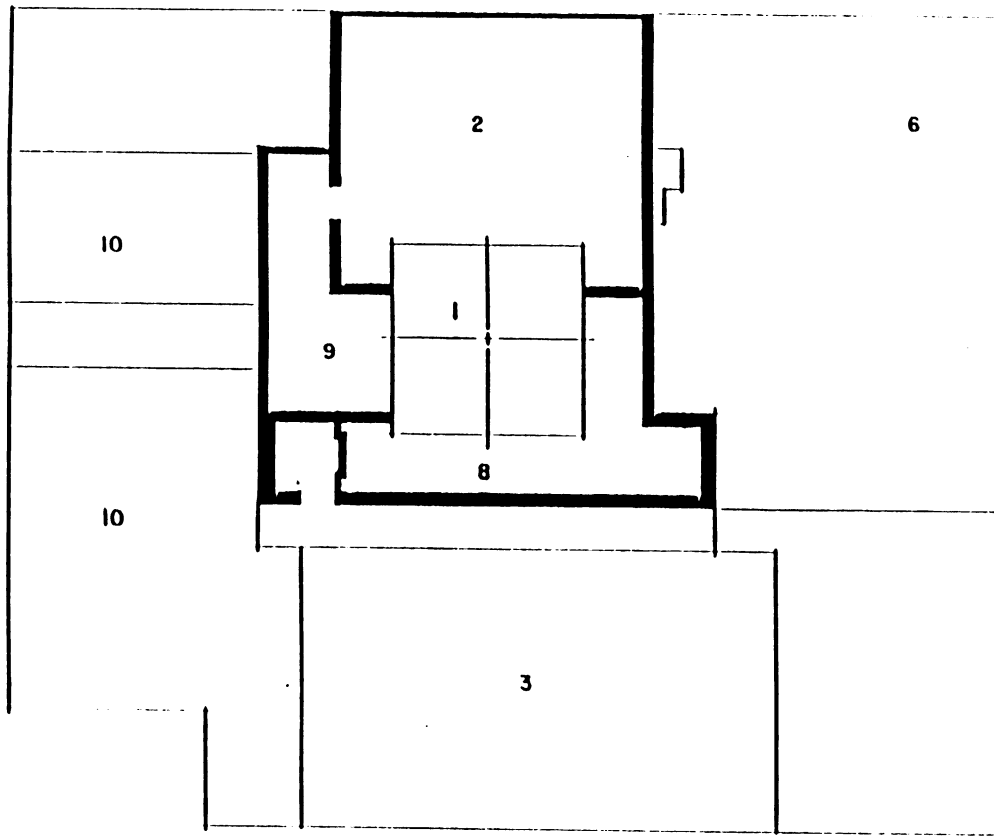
Floor Plan of the KW-Reactor at the 0 Foot Elevation.
